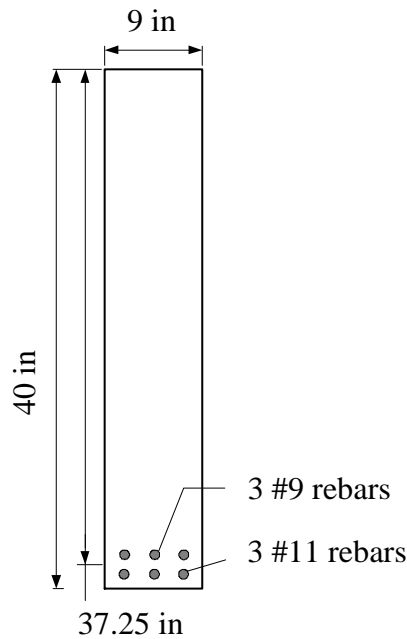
Section dimension and arrangement of longitudinal reinforcement steel rebars for section UHP/St60 40R-3
